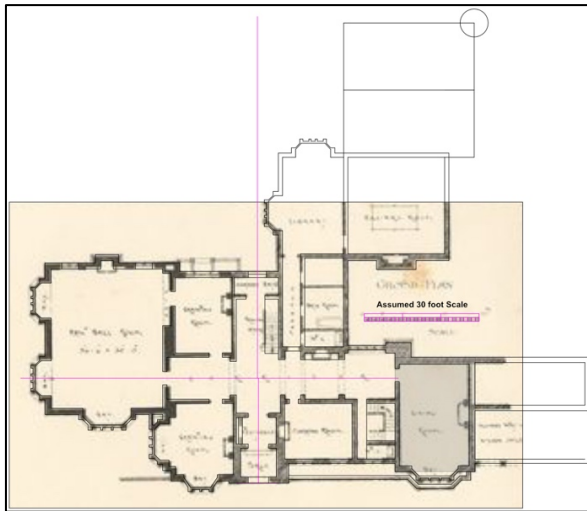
CAD tracing of Arborfield Hall from 1885 plan
